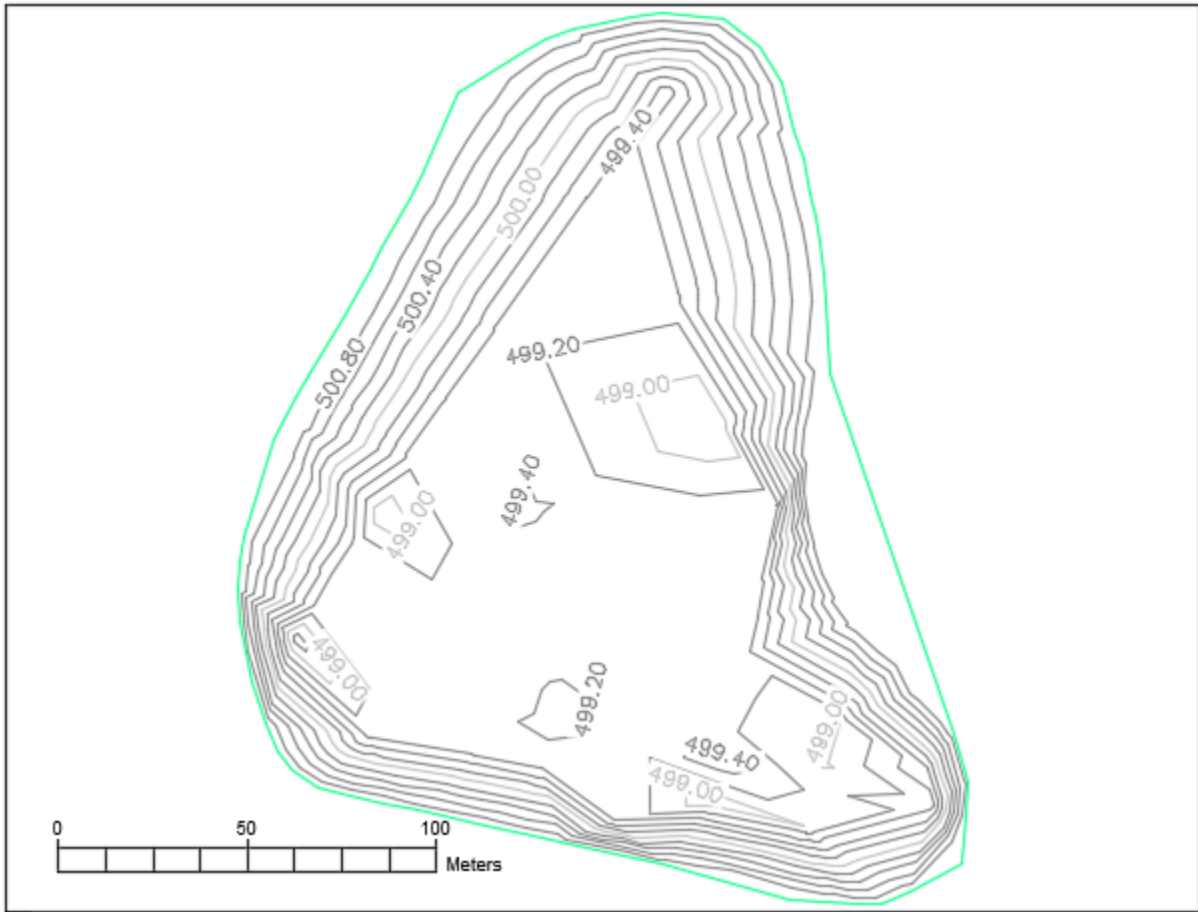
Measured in June existing pond bottom elevation with a 20 cm contour interval, where the design pond bottom elevation was 499.0 m.
